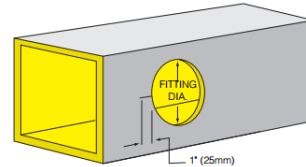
A. Cutting hole in duct board for flexible duct connection.
